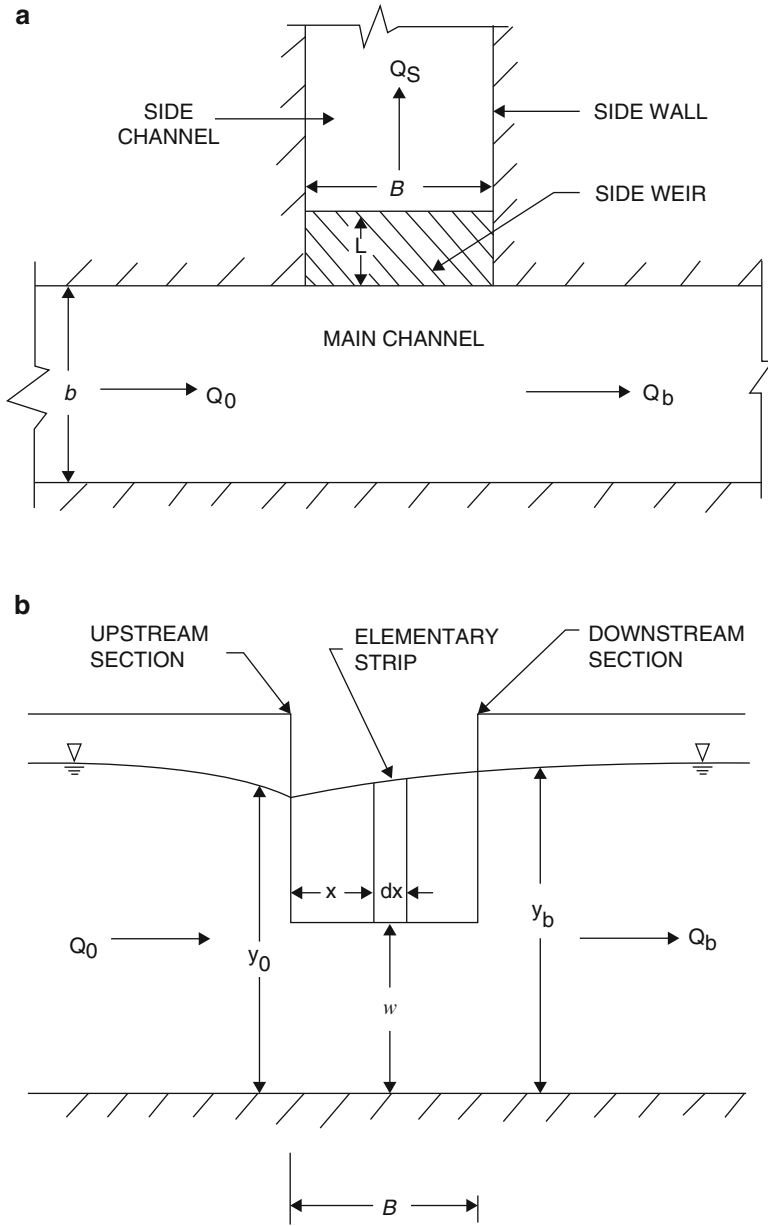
Definition sketch: (a) plan and (b) elevation
